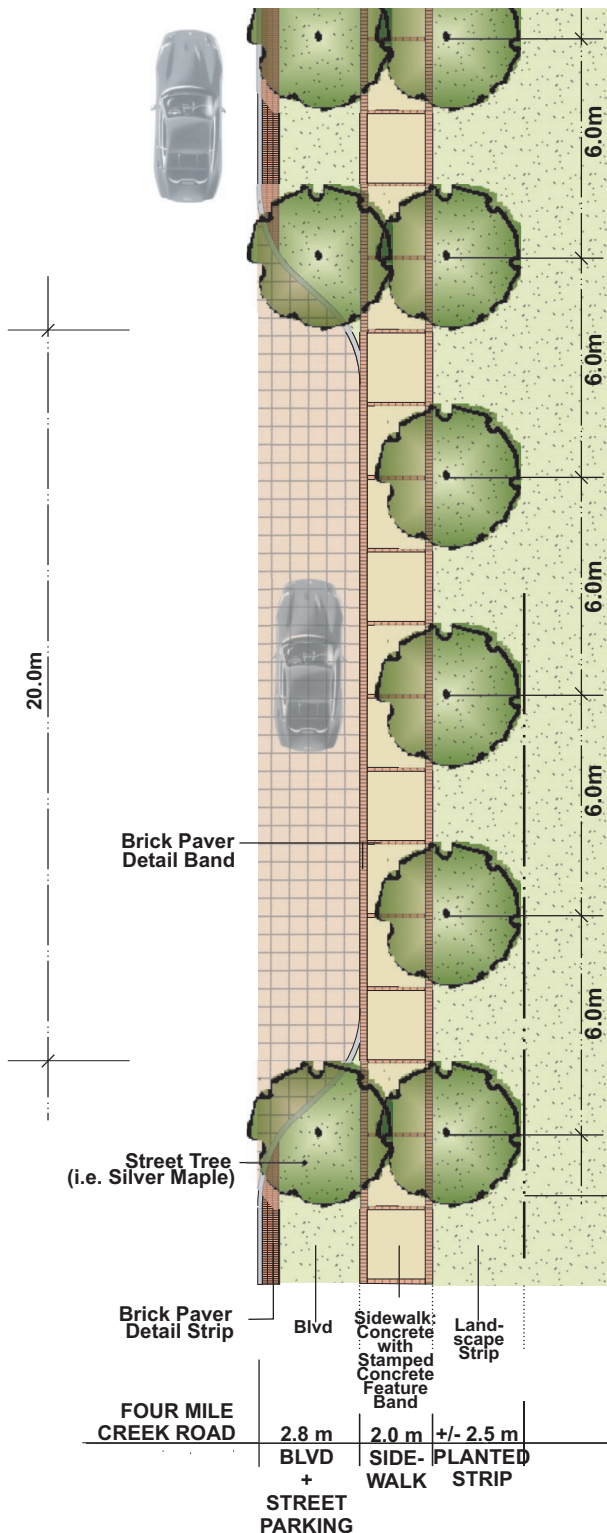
Streetscape plan show on-street parking, sidewalk paving and street tree planting in grass boulevard.
